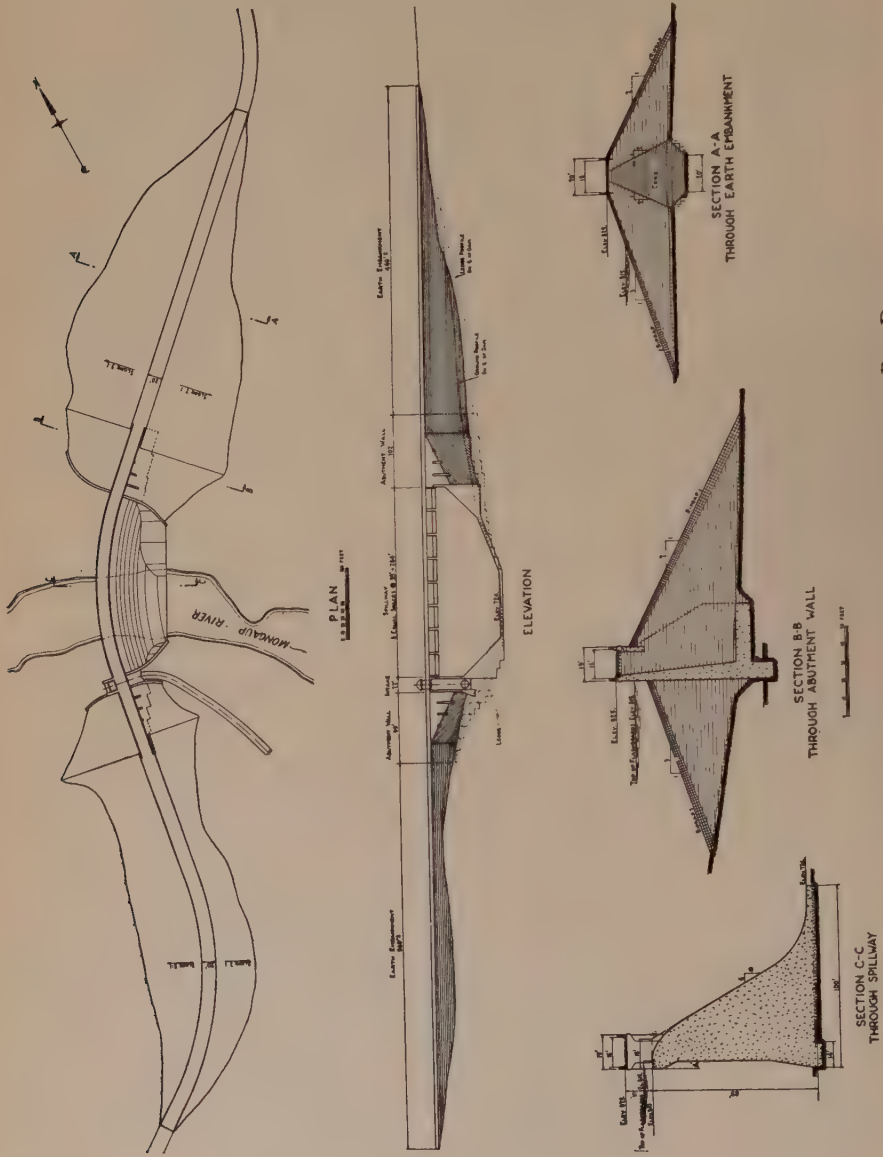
PLAN, ELEVATION AND SECTIONS OF RIO DAM
